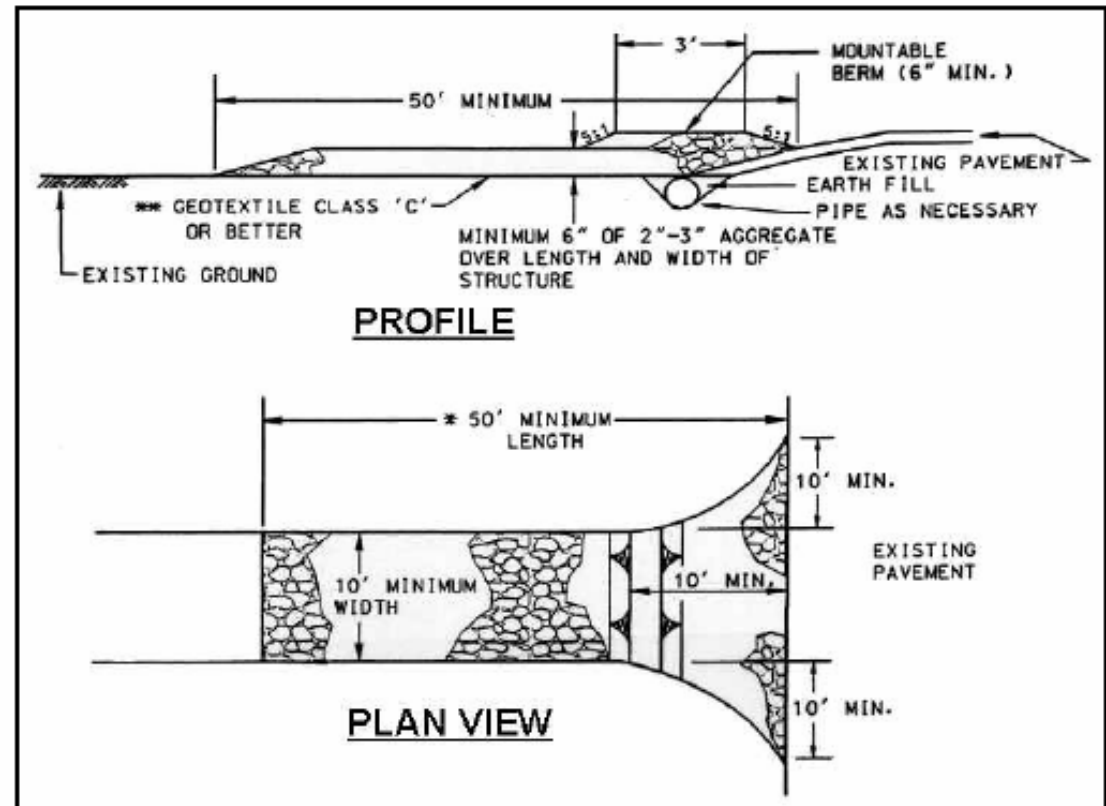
Stabilized construction entrance details (Maryland Department of the Environment, 1994).
